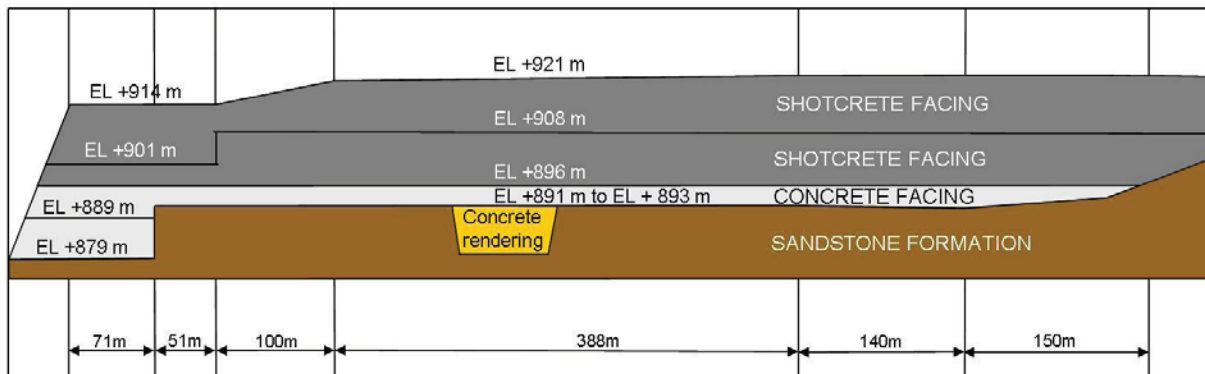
Front elevation of the reinforced soil wall at Hetaoyu Project
